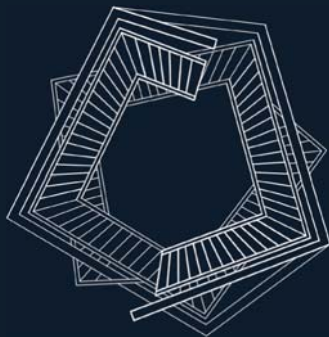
(Top Left) - A floor plan of the top of the tower which shows how the two stair towers connect at the peak.
